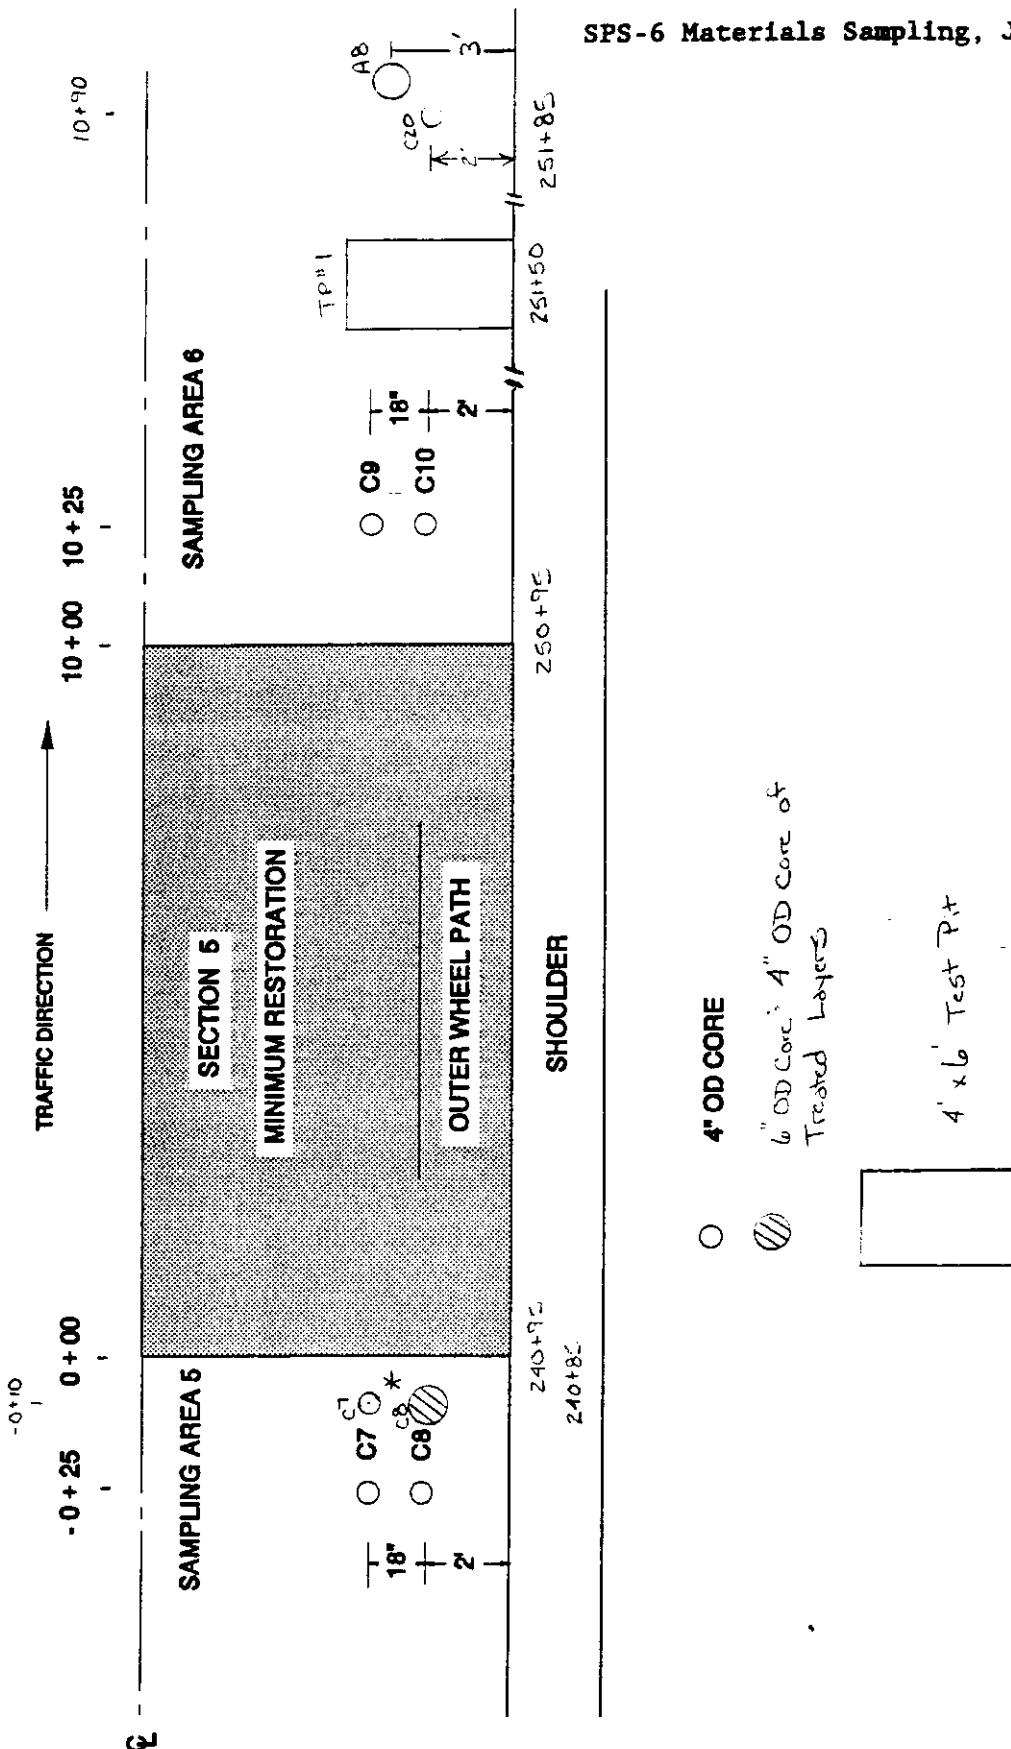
Example of "Pre-Construction" Sampling Plan for Test Section 2
